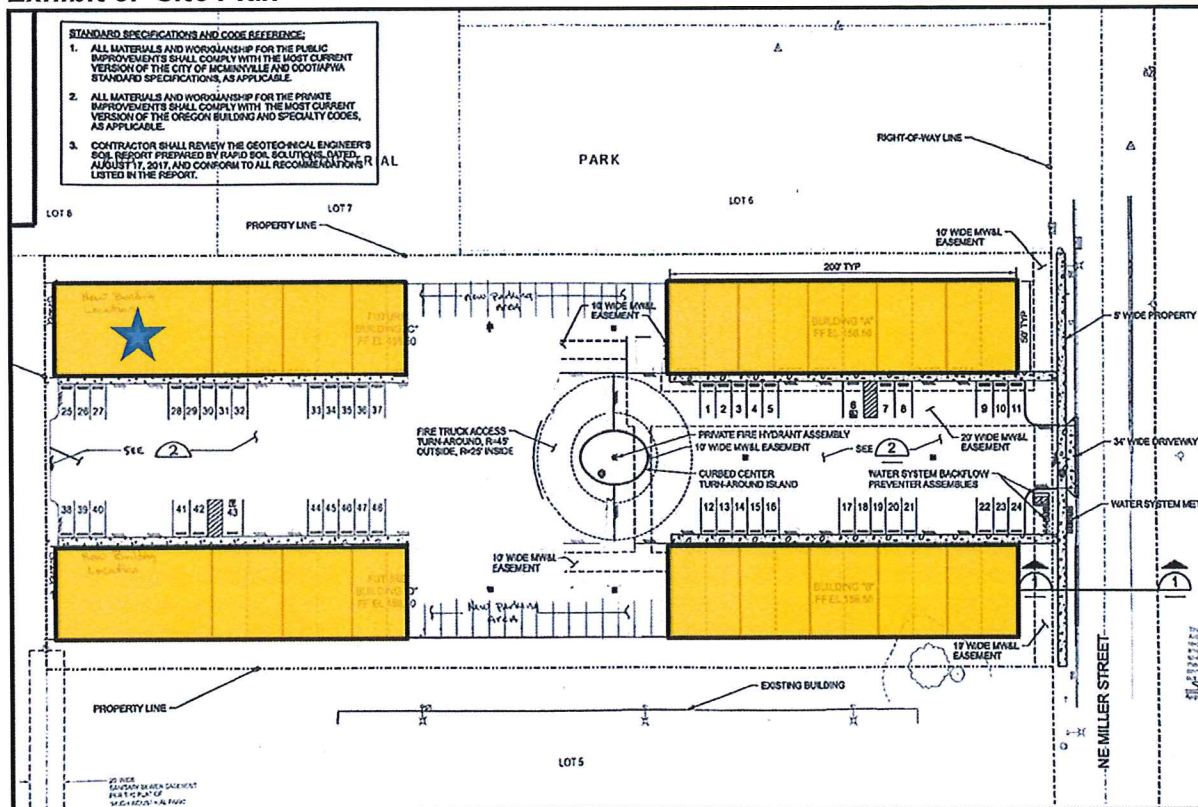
Site Plan Detail, Phase 2 (with revised parking)
